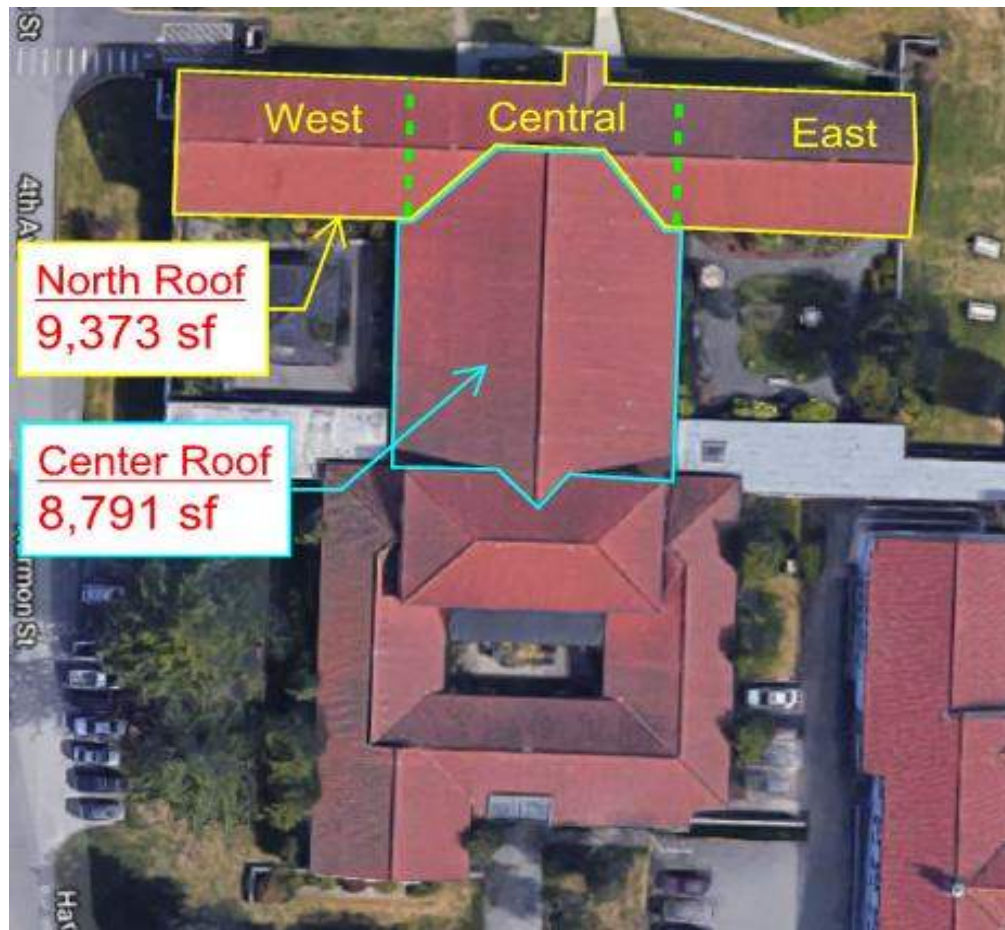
Depicts an overview of the roof areas at the 2010 Building. The yellow outlined roof area at the north end of the building represents the requested area of roof to be included in the roof survey. The north end (yellow) roof area, as the focus of our survey, measures approximately 9,373 square feet. The roof area outlined in blue represents the additional roof area recommended to be included into a reroofing project as a result of visual deficiencies observed as part of our preliminary roof survey. The additional roof area, outlined in blue, measures approx. 8,791 square feet.
